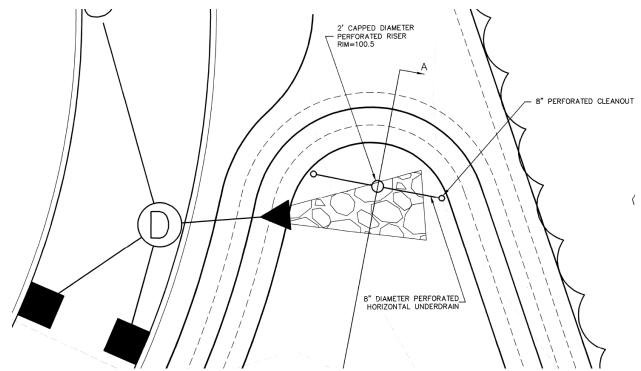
Typical plan view of multi-inlet configuration of a SGW system
